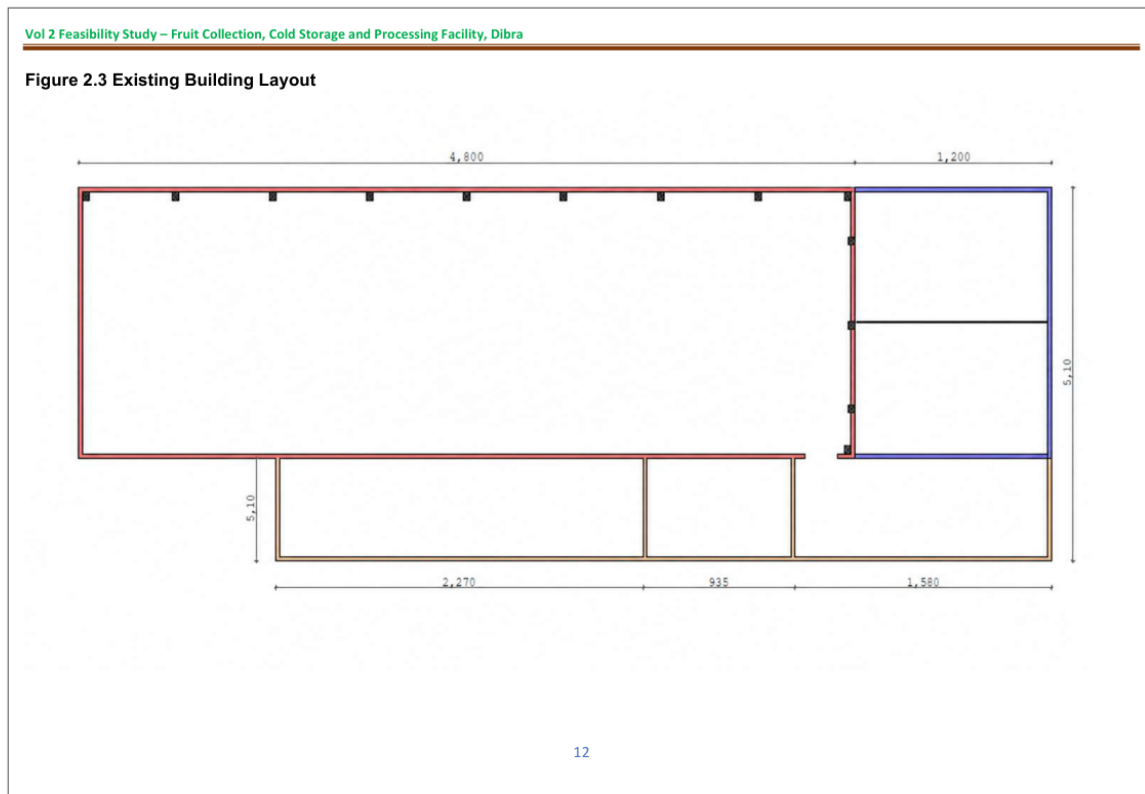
Existing building – indicative layout. Source: Dibra Feasibility Study. Indicative – not for construction.
